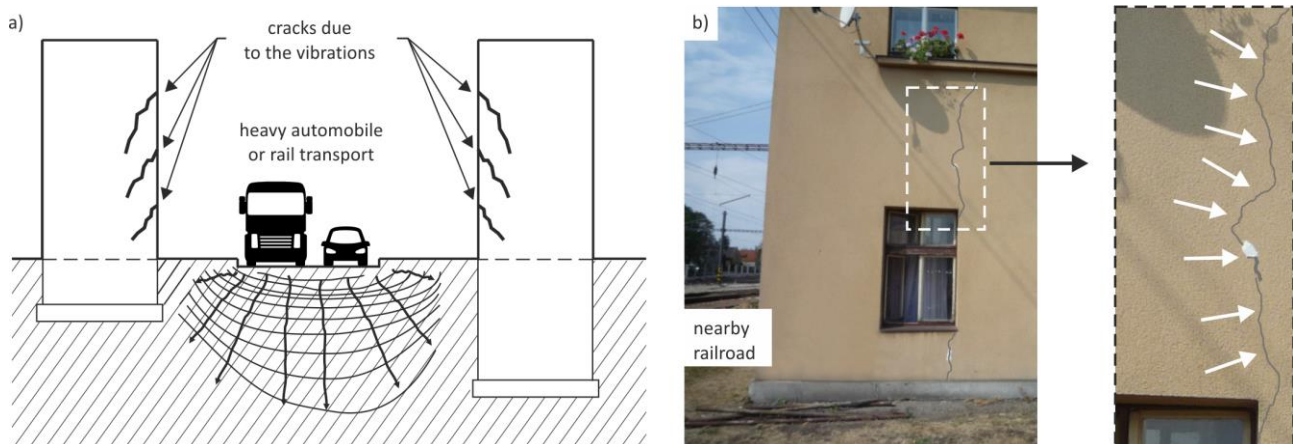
a) Failure scheme of a structure due to the effects of technical seismicity, b) Failure of a masonry building due to shocks caused by railway traffic
